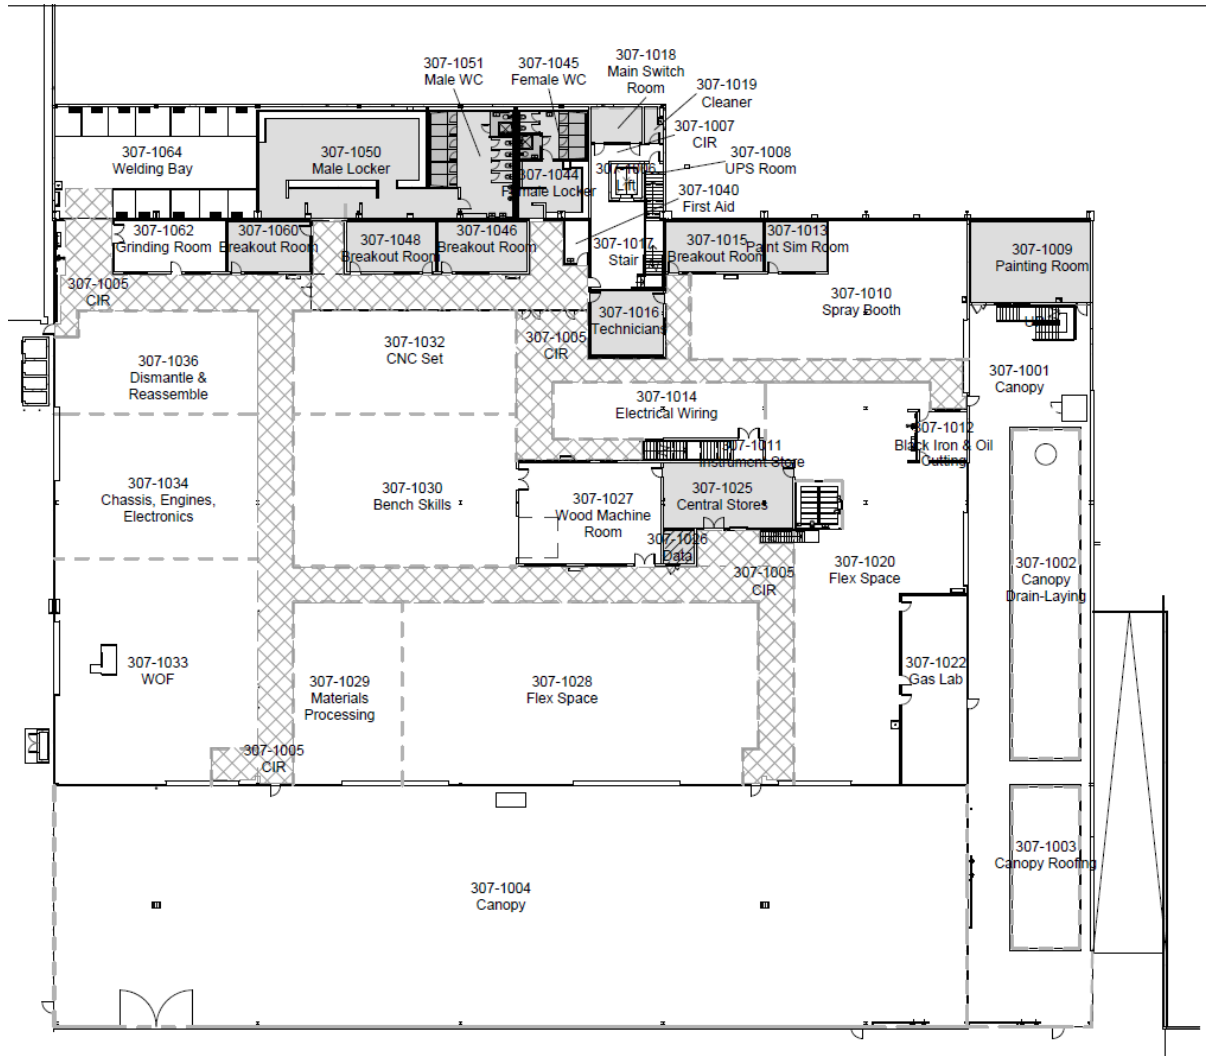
Mataaho B304 – Level 1 floor plan (Dimyadi, 2014a).
